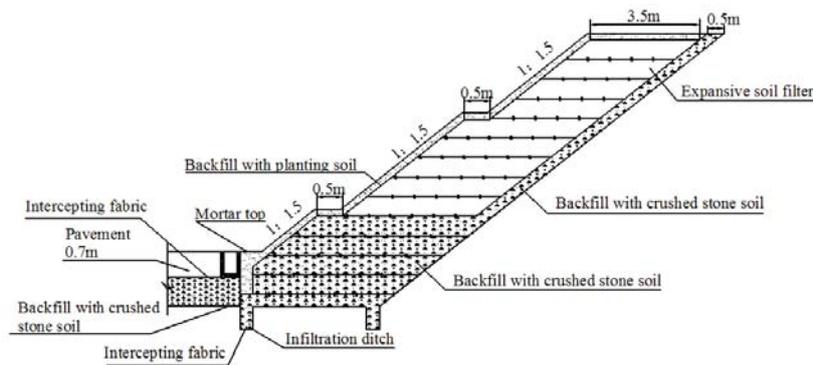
Flexible supporting structure for cut slope in expansive soils (Yang et al. 2009)
